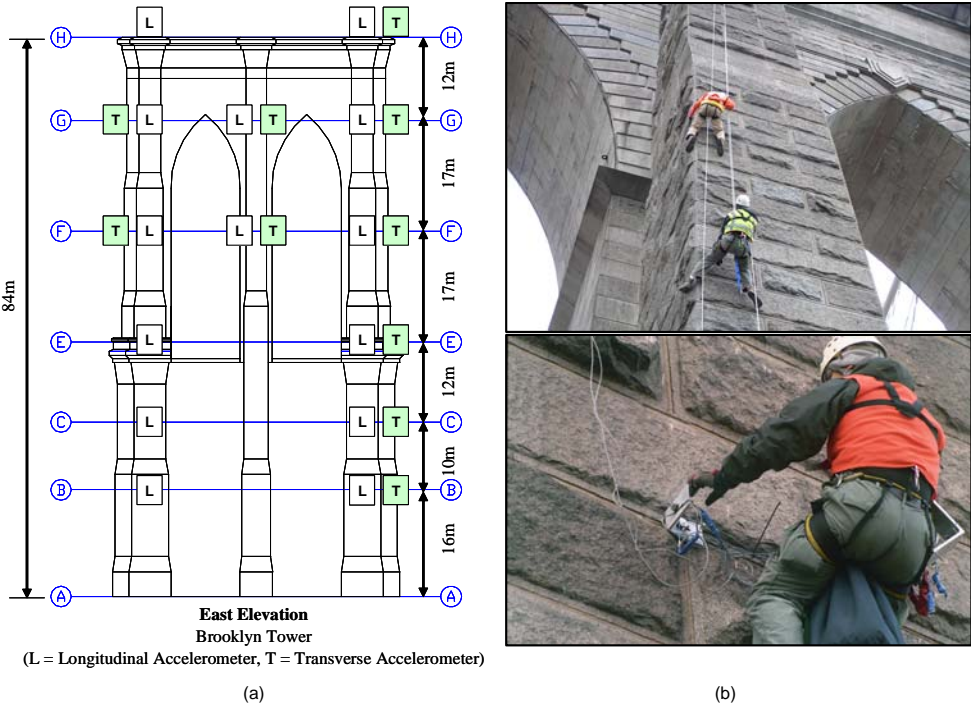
(a) Accelerometer layout for the Brooklyn Tower, and (b) Accelerometer installation
